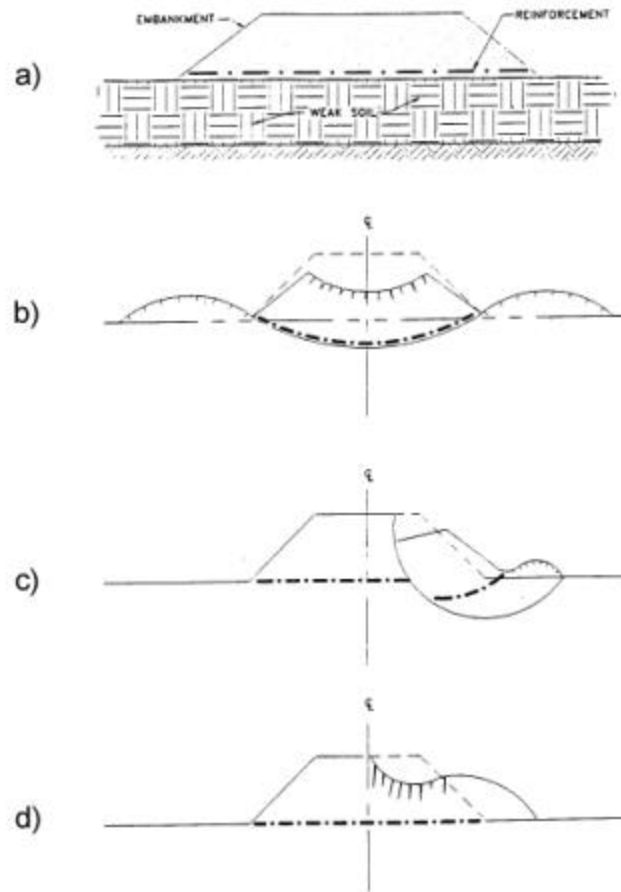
Reinforced embankments: a) concept; b) bearing failure; c) rotational failure; and d) lateral spreading.
